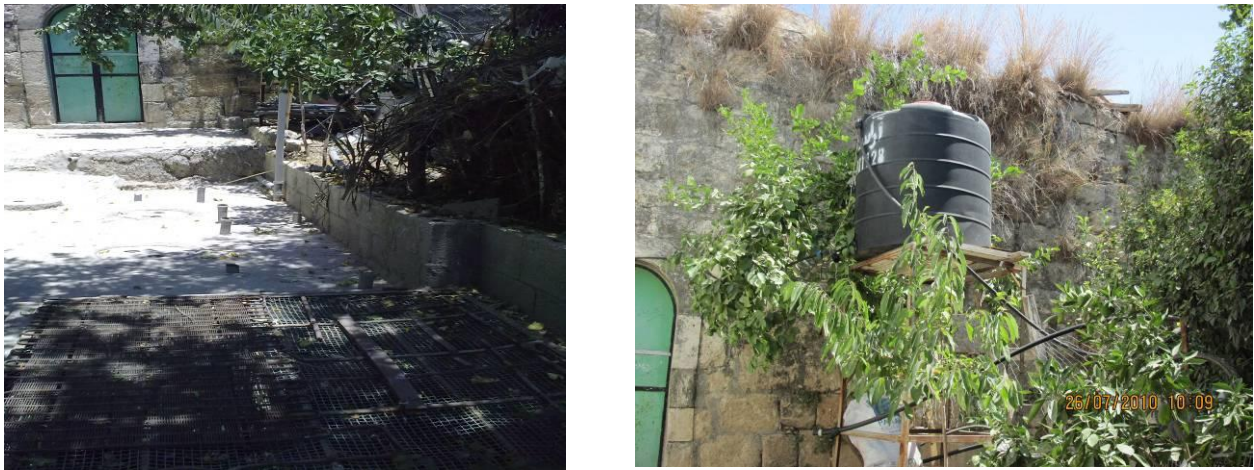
Onsite household Upflow Gravel Filter wastewater treatment plant in Beit Sira Village in Ramallah Governorate
